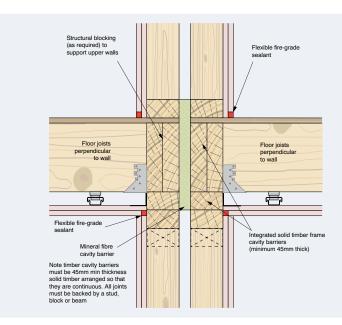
Fire-protected timber frame wall /floor junction with integral cavity barriers – beams perpendicular to wall Class 2 building.
